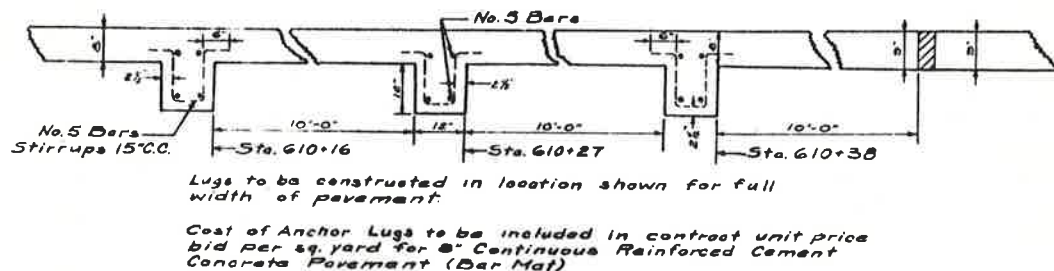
Details of 12- by 12-in. reinforced concrete anchor restraining lugs (not to scale).
